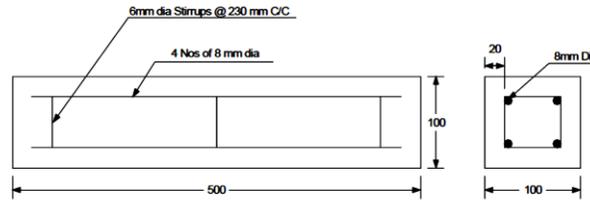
Reinforcement Details of Flexure Beams (Size: 100mm × 100 mm)
